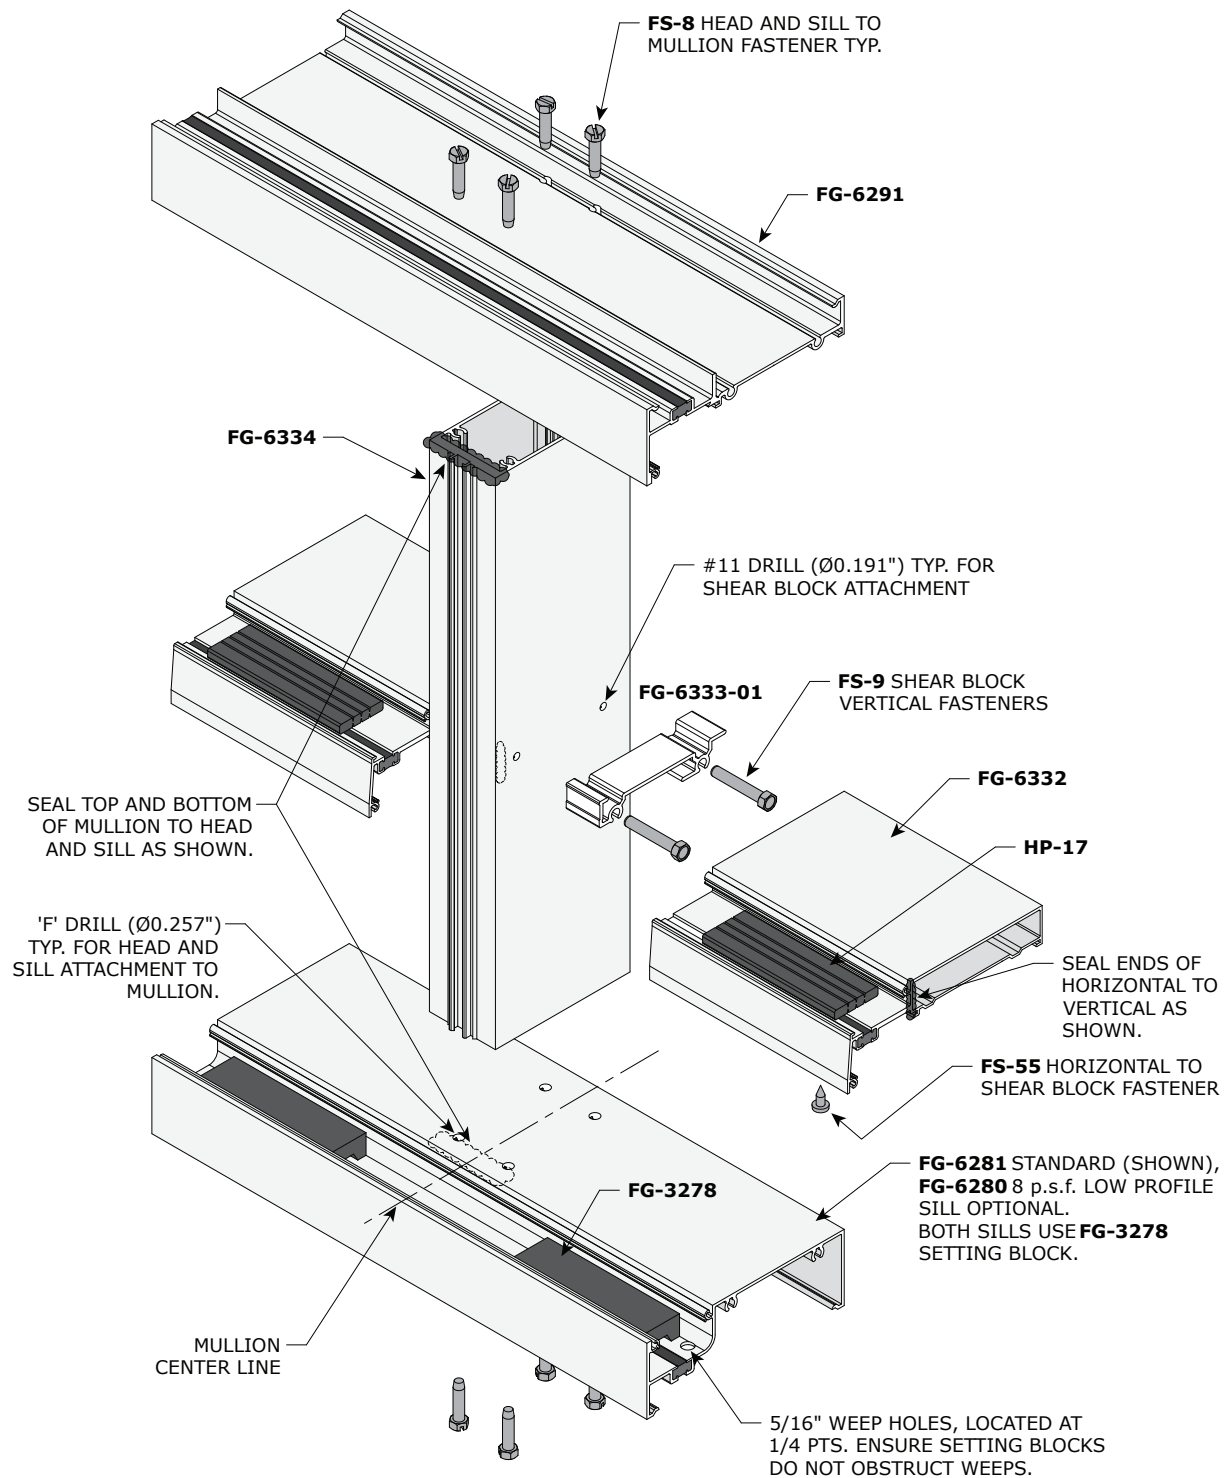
Frame Assembly - Front Set, 2-Sided S.S.G. System
